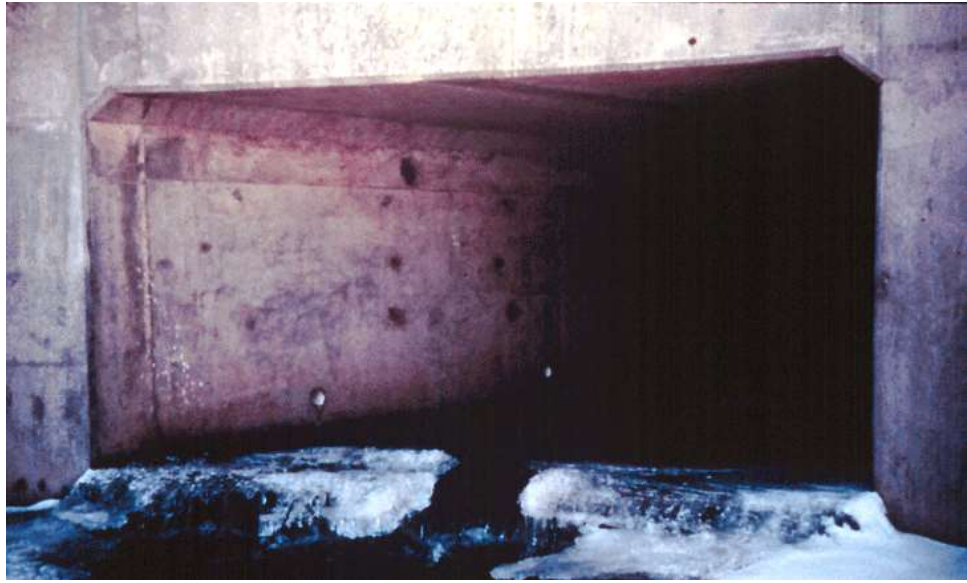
Culvert Headwall and Wingwall End Treatment
